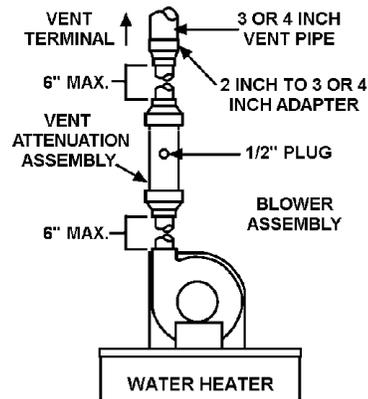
Typical Installation for Vertical Vent with 3 or 4 inch Pipe
